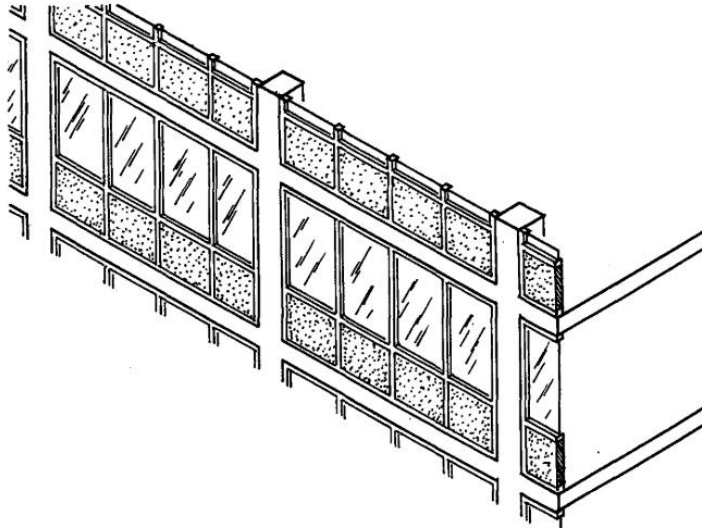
Framed light panel façade system (Göçer, 1997)
